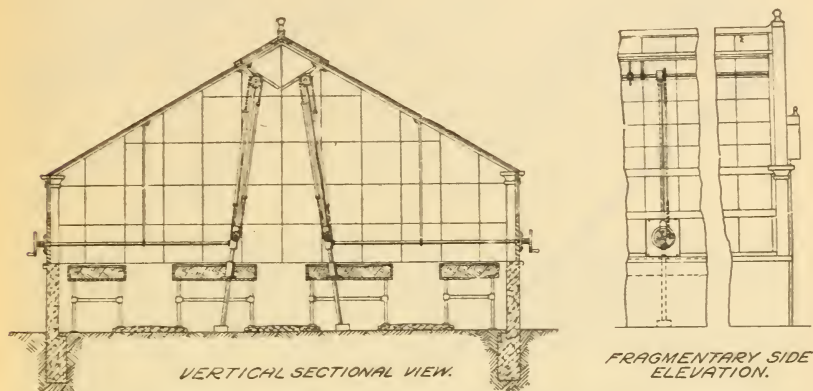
Arrangement for opening roof ventilator from without, on sides of the greenhouse
